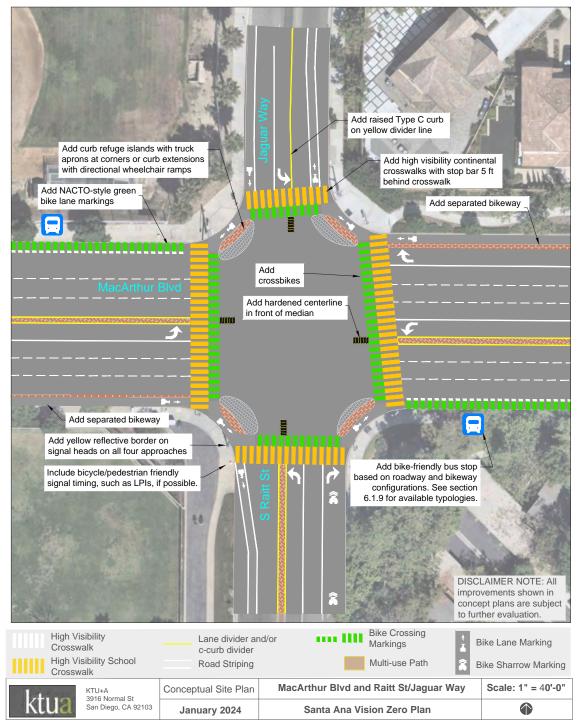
MacArthur Boulevard and Raitt Street Recommendations
